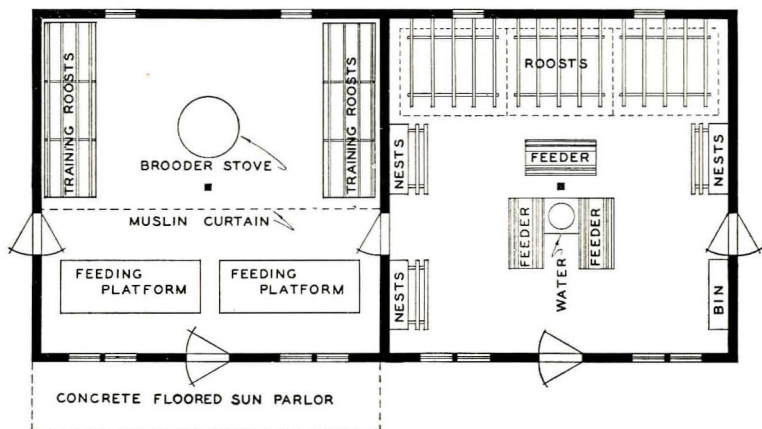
Floor plan of 20x40 laying house with one room converted into a brooding room
